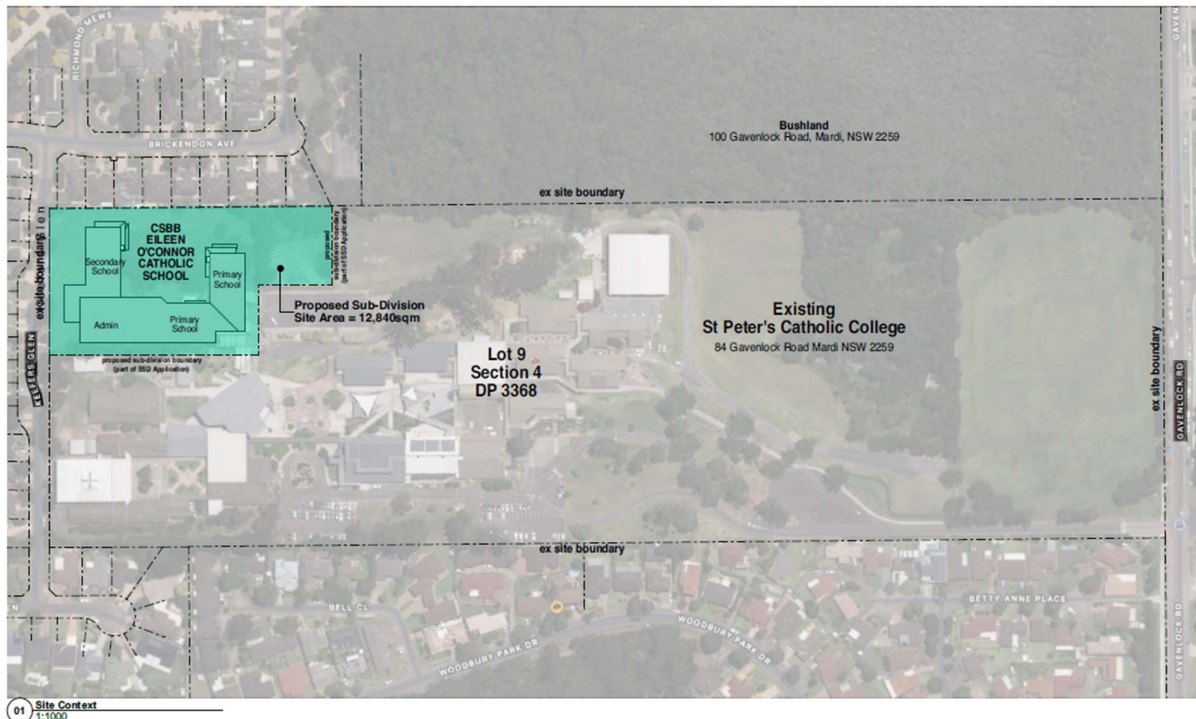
Site Campus Master Plan Source: Stanton Dahl Architects
